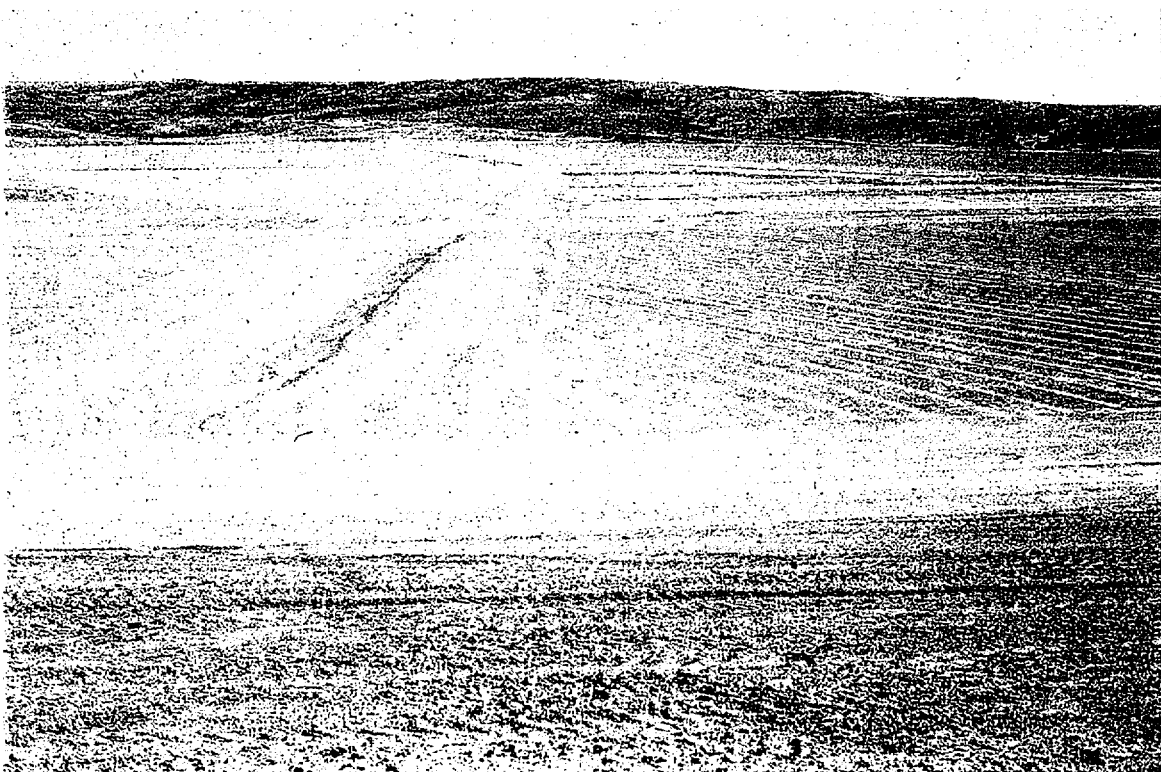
Looking northward down south low-flow channel. The edge of topsoil placement and the wick area is the gray area in the center of the photo. (Sep 1989)
